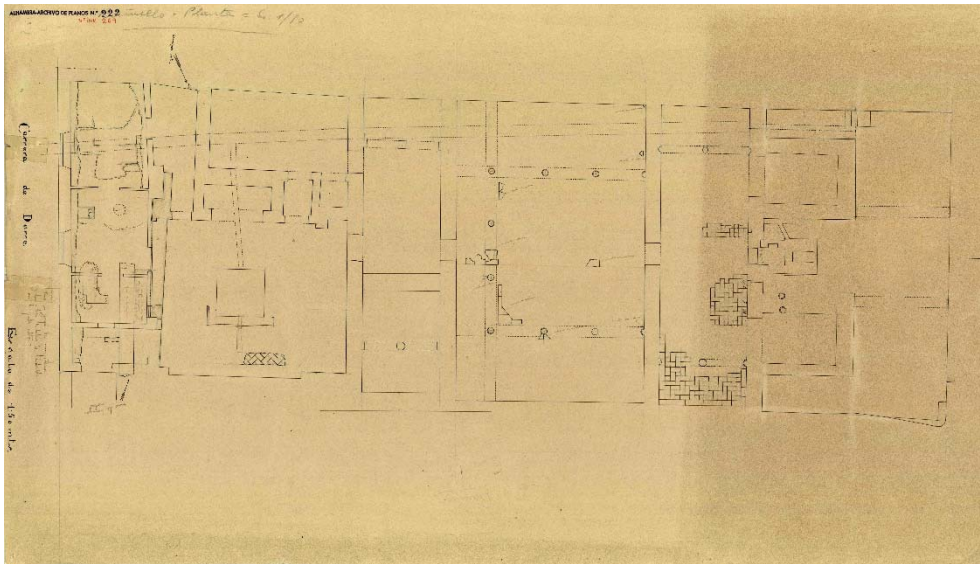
Ground floor plan of El Bañuelo with archaeological details (After L. Torres-Balbás, 1928, APAG P-000269).
